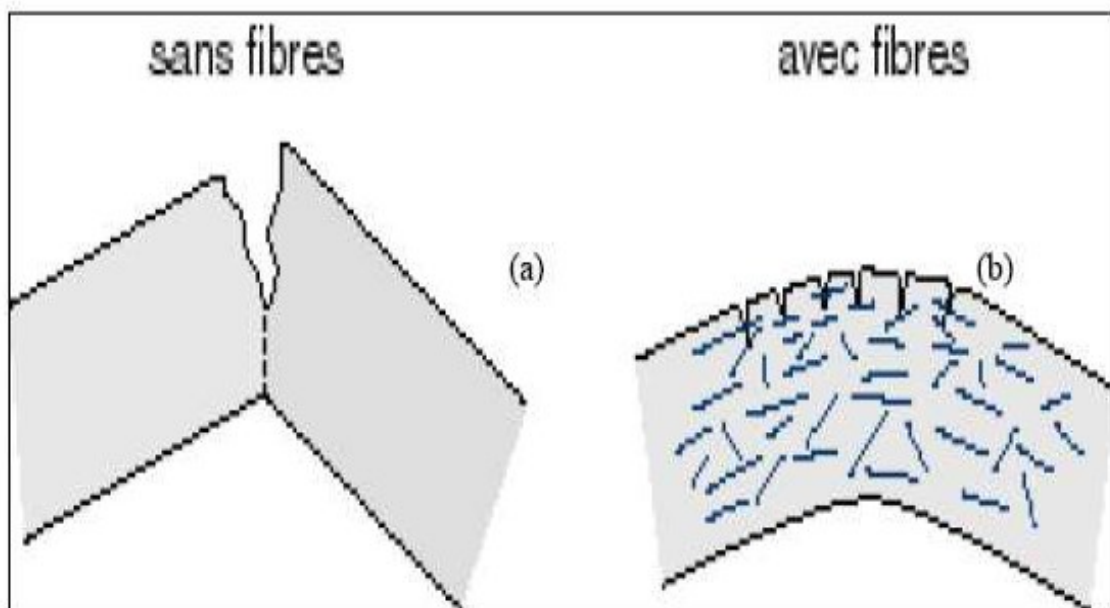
Cracking of concrete (a) without fibre, (b) with fibre
